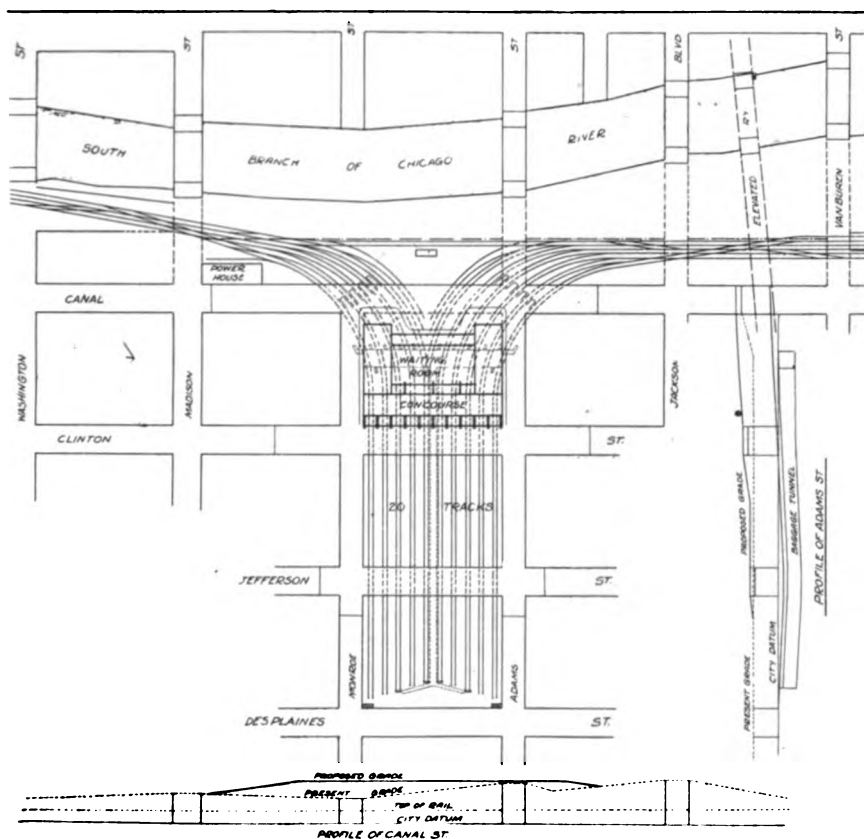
PLAN WITH TRACKS BELOW STATION REQUIRING ELECTRIFICATION.
